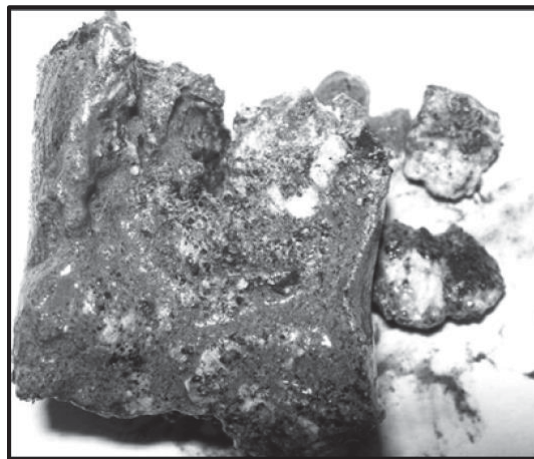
Concrete slab of Yongan dam damaged by TSA (Mingyu et al.-2006)
